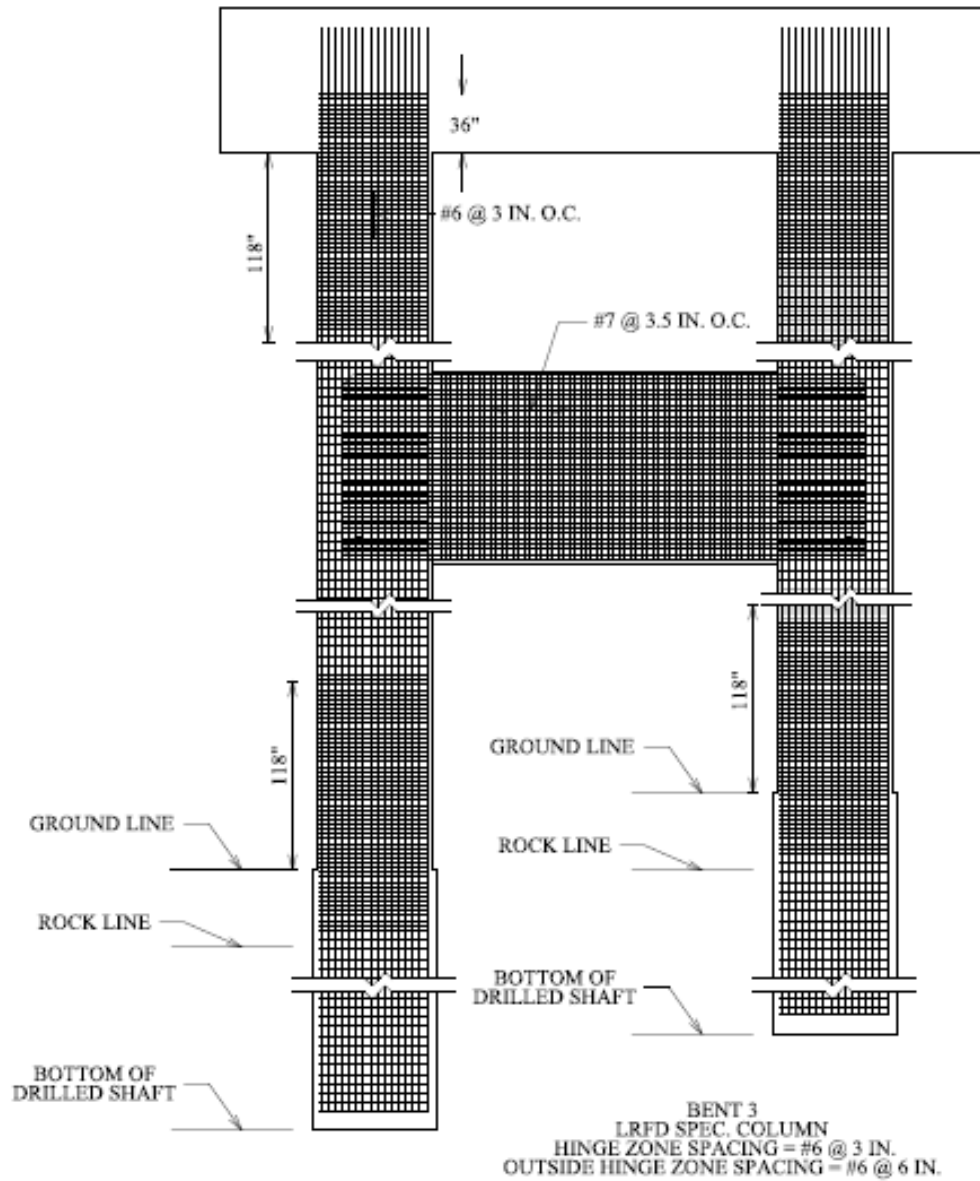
Scarham Creek Bridge Bent 3 LRFD Specification
